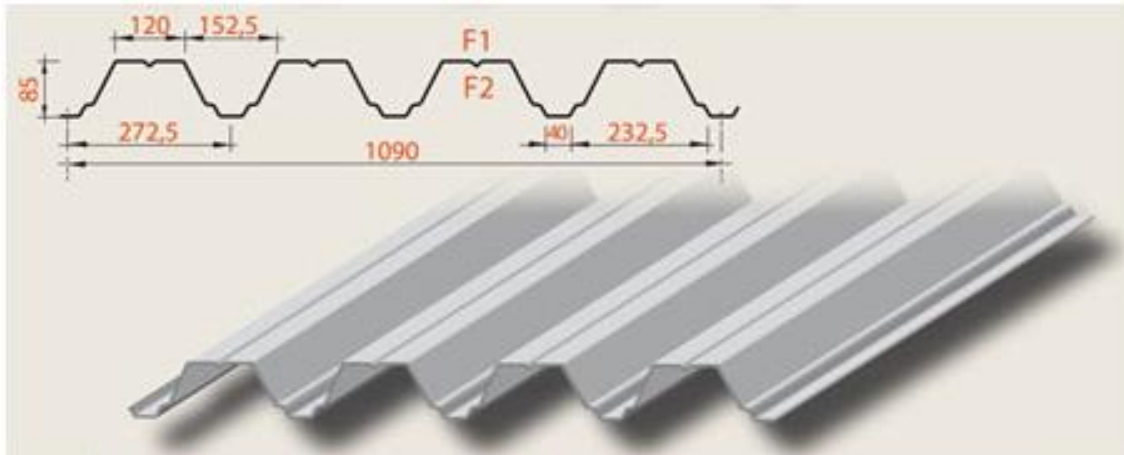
Roof trapezoidal cladding Hacierco 84/273 (TR84)
